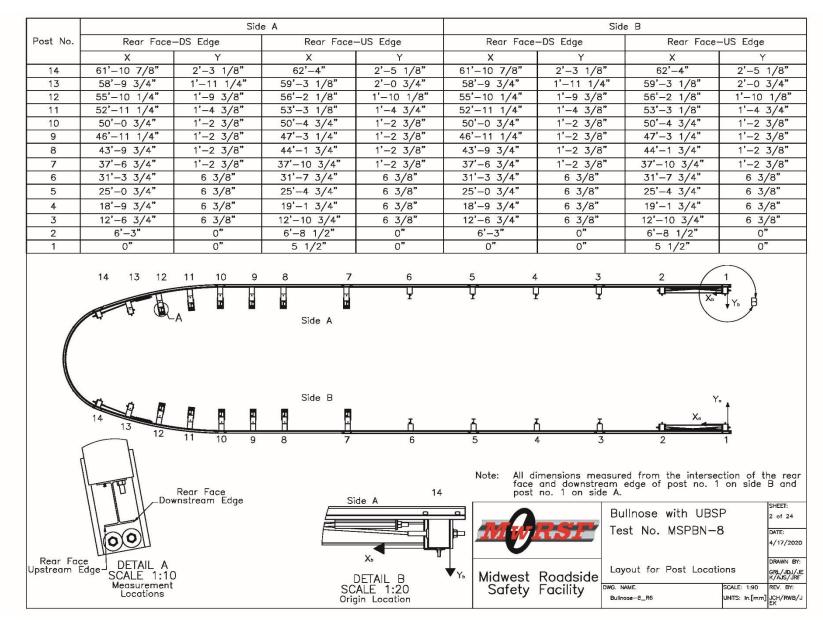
Layout for Post Locations, Test No. MSPBN-8
